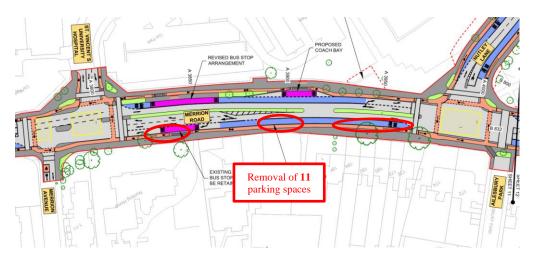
Proposed scheme design on Merrion Road (SVUH)
